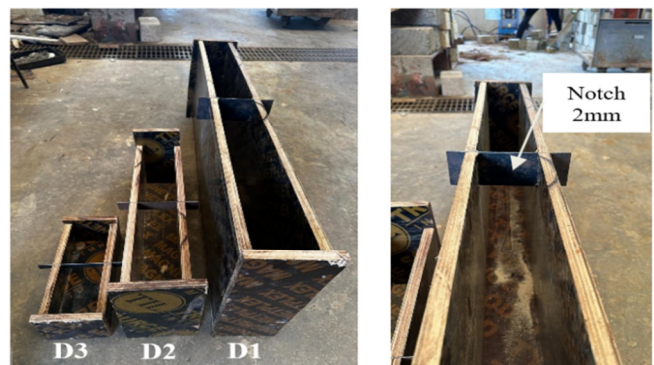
Prepared plywood formworks and metallic notch of 2 mm.
